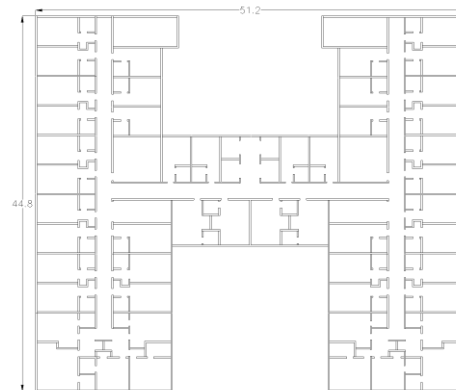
Index building floor plan for a 12-story CLT hotel (dimensions in meters)
